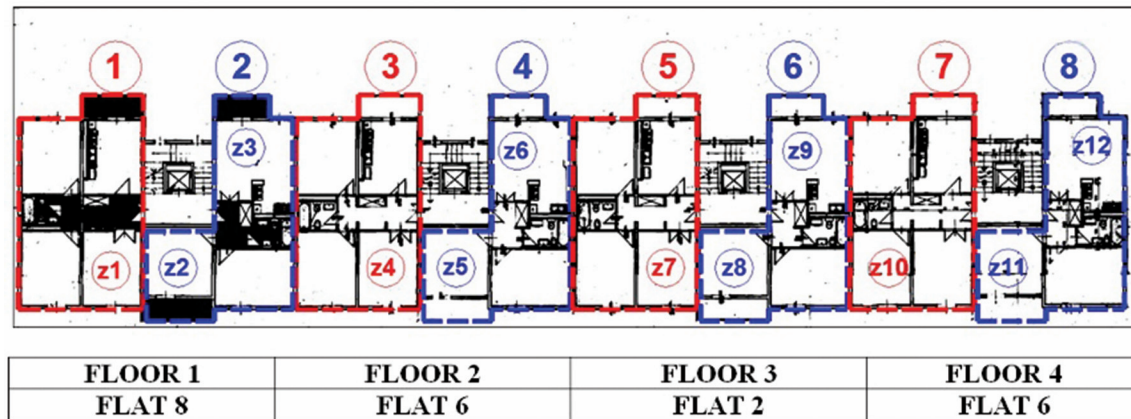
Thermal zones and worst flats/floor in Building A.
